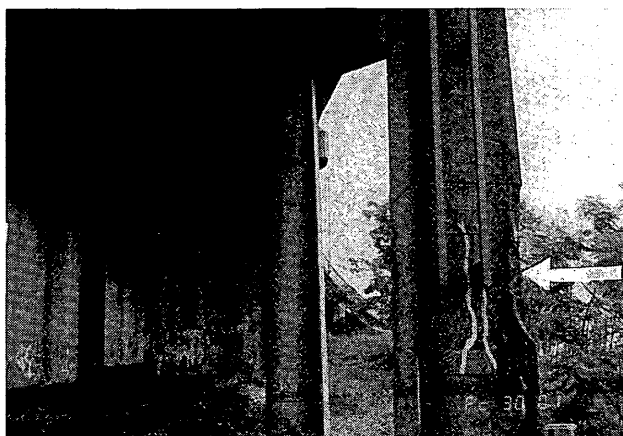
Corrosion-related deterioration of bridge pier at Site 30.
